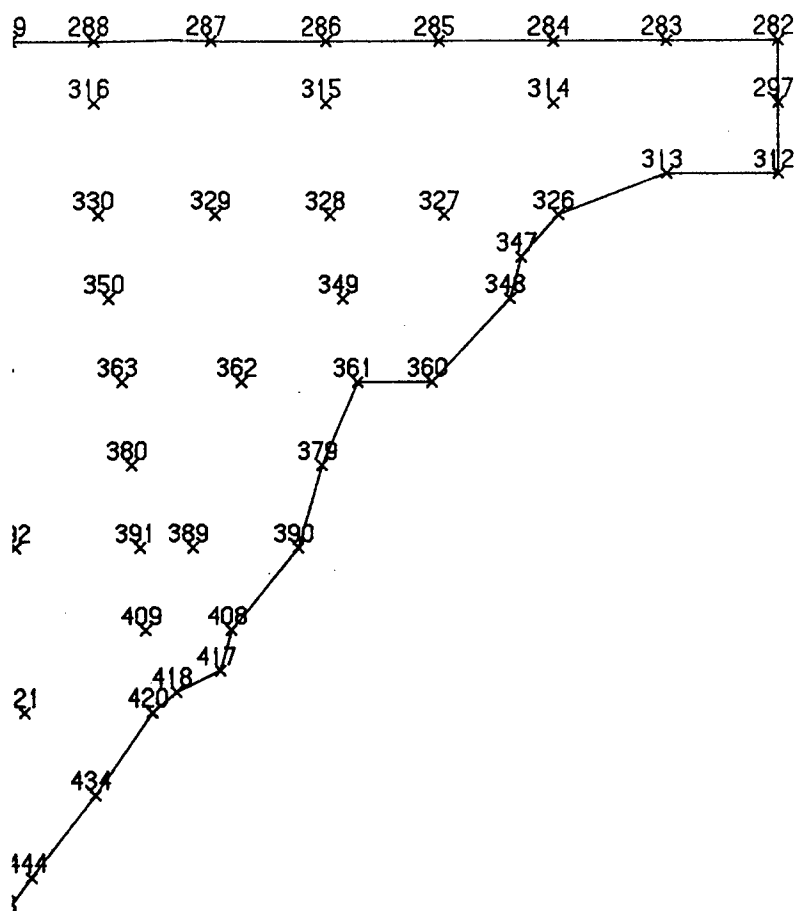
DEVELOPED VIEW OF UPSTREAM FACE, LOOKING DOWNSTREAM
